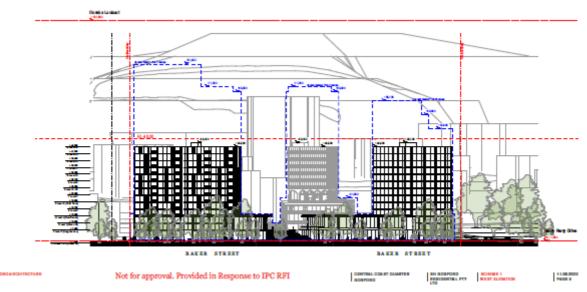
Extract from Envelope Analysis Scheme 1 showing elevation from Baker Street Source: Applicant's Response to Commission
